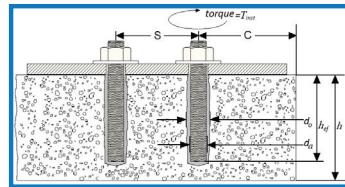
Typical Installation Detail for Threaded Rods or Reinforcement Bars
